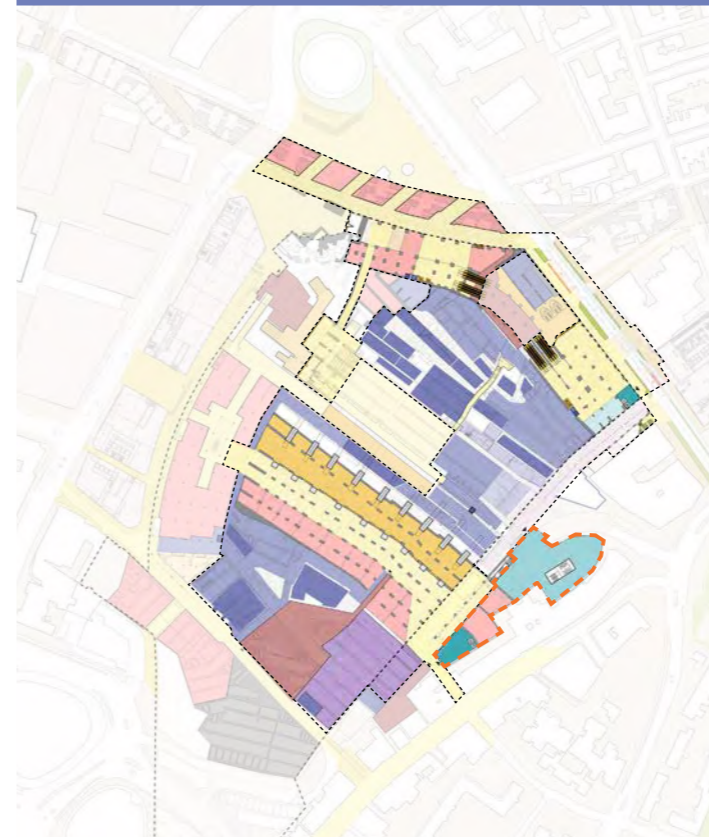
Grade / Undercrofts Level Sketch Plan
